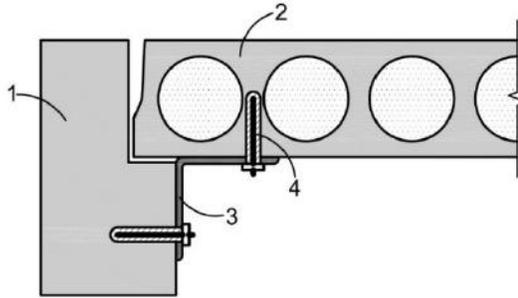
Retrofitting of the diaphragm chords at the floor perimeter: 1- existing RC beam; 2- existing hollow core RC plank; 3- steel angle, and 4- steel anchor.
